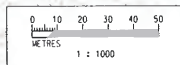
/P/OAP/04/01105 Rev. D1
